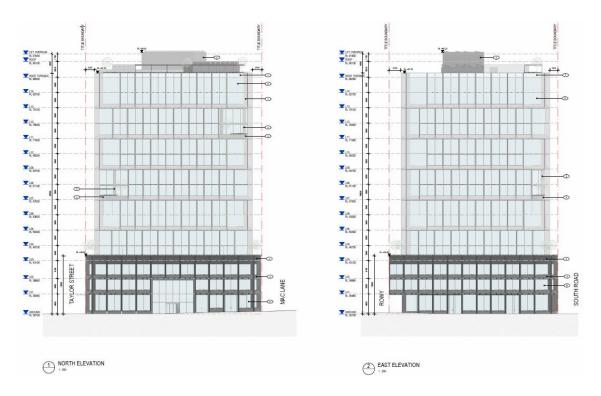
North (left) and East (right) elevation of the proposed development (KUD, 2024).
